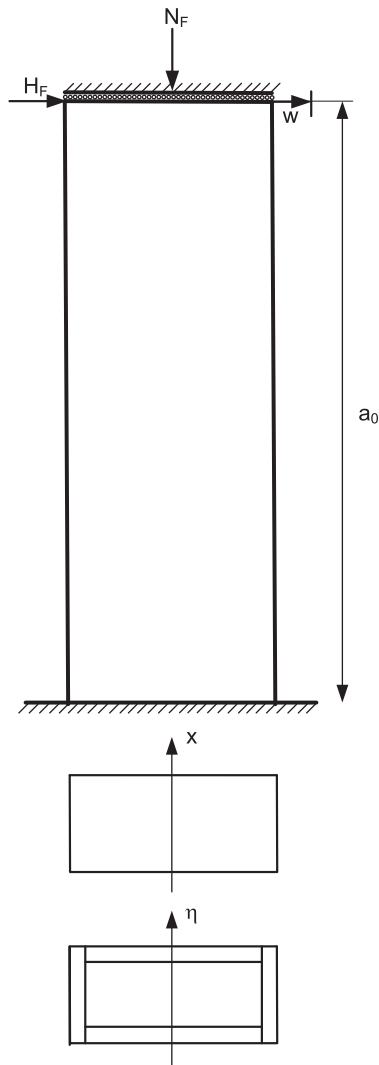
Box column with walls of unstiffened and cellular plates, the two ends are built-in.
